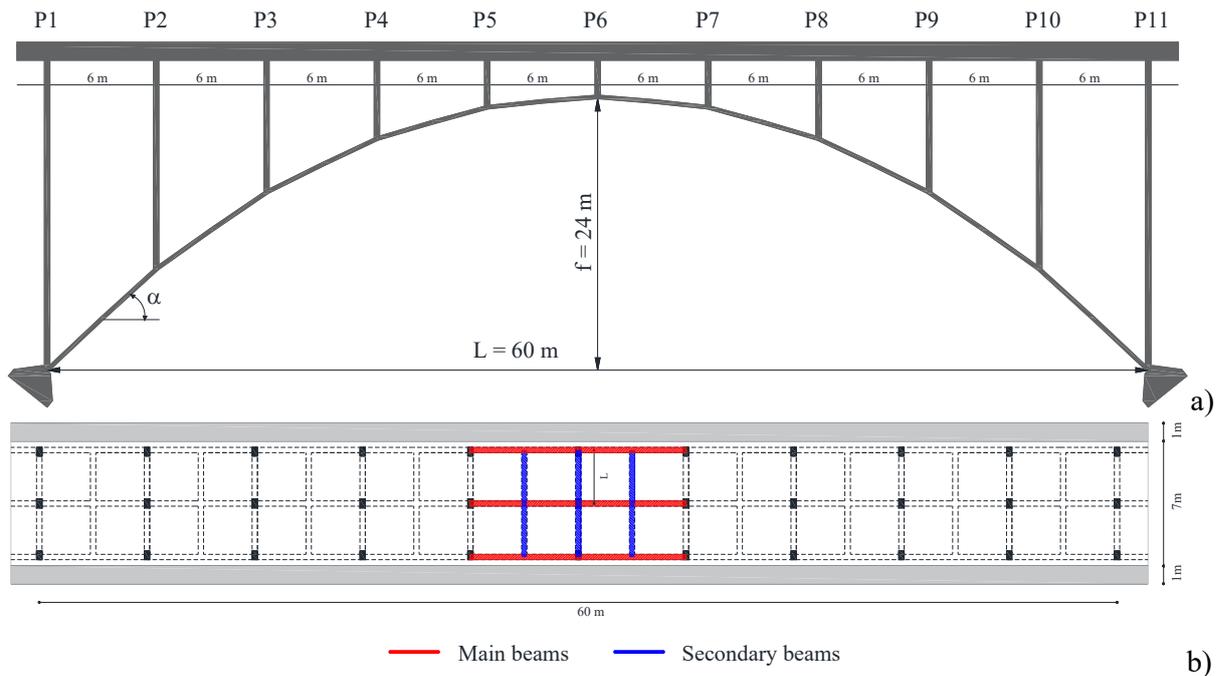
a) Longitudinal view of the deck arch bridge assumed as case study; b) Plan view of the deck.
